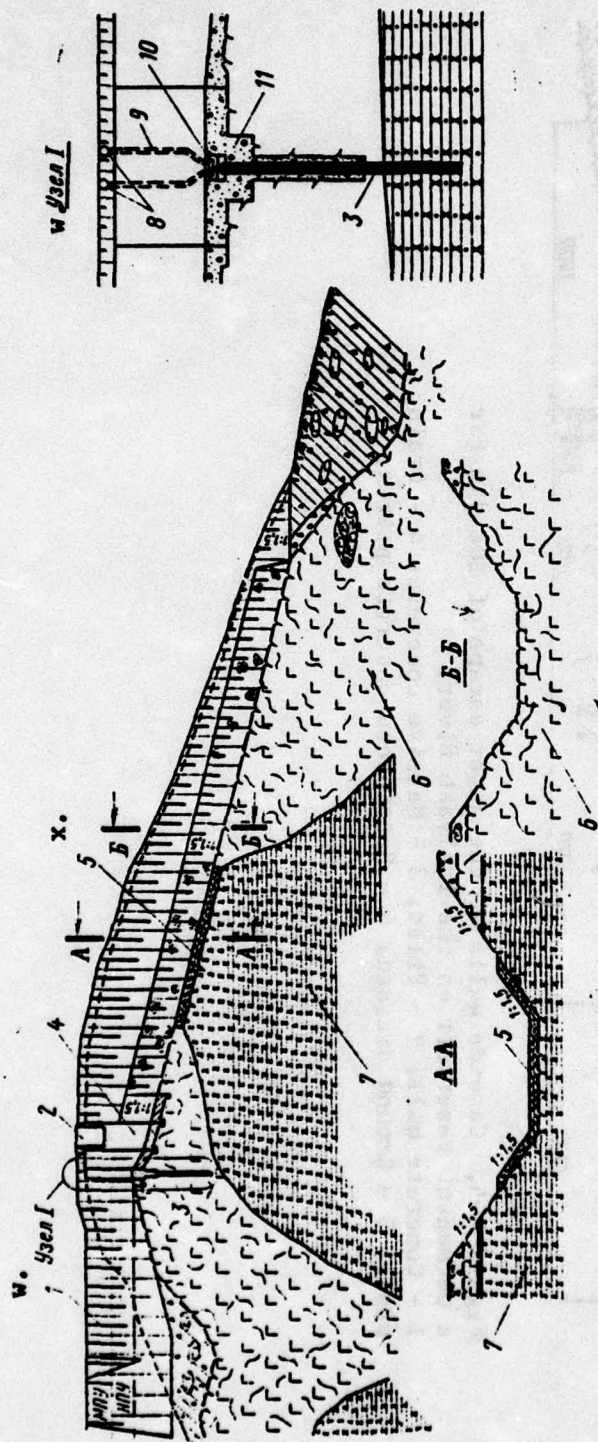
Spillway structure of the installation on the Oyuur-Yurege River.
